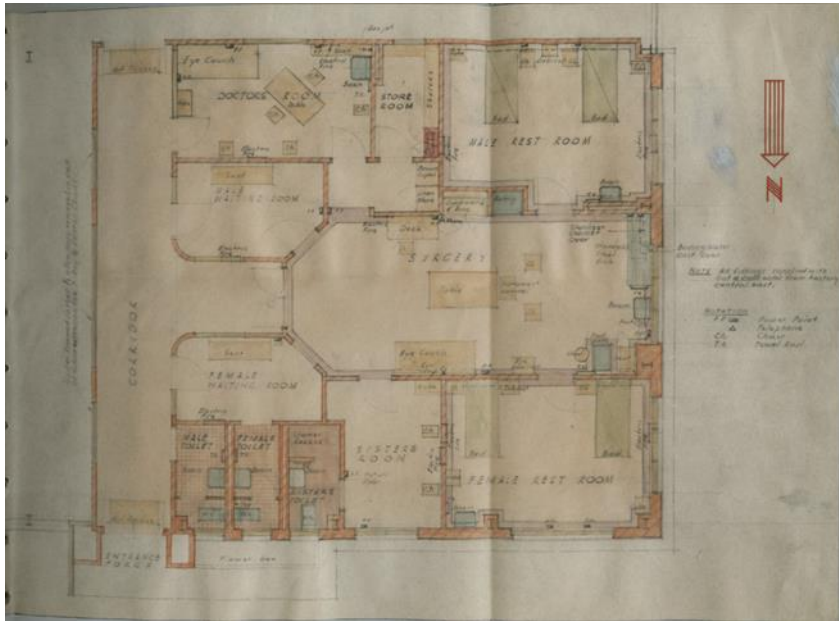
Hospital facilities, north west corner of Plant No.3, c1943 (SLSA, BRG 213/73/11/28)
